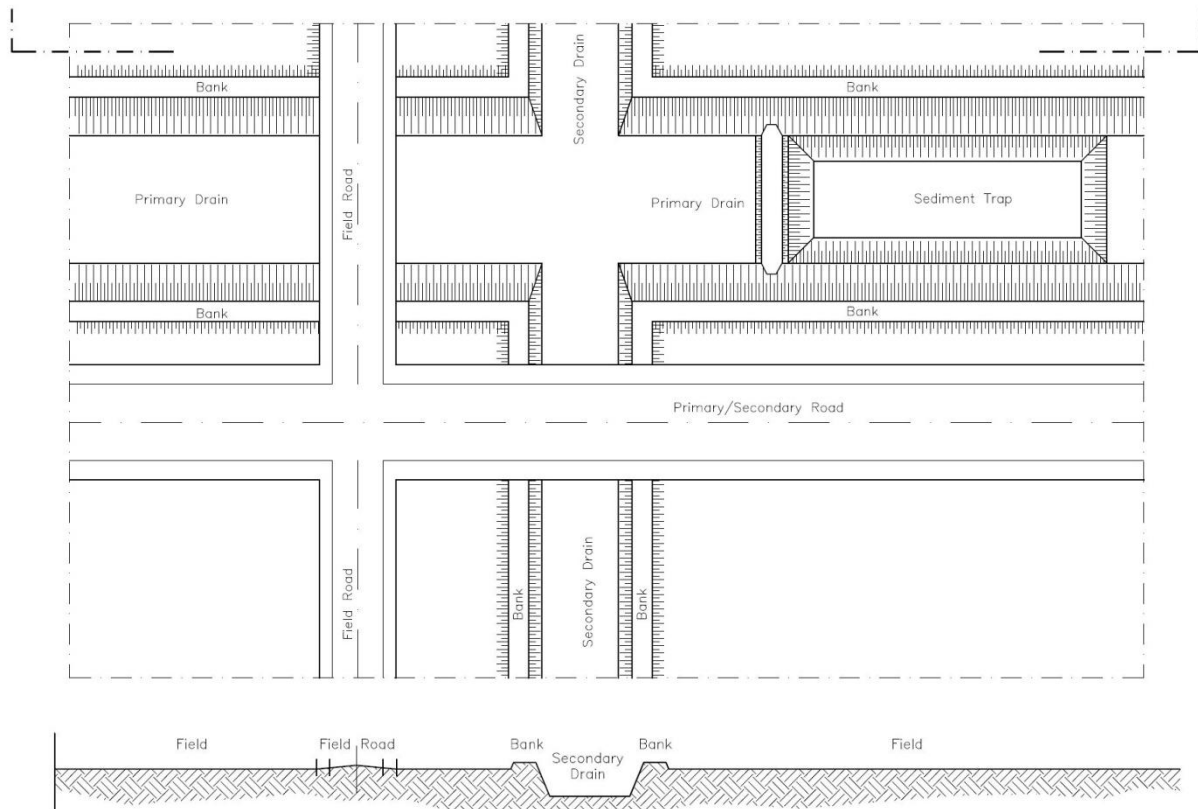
Planimetric view and cross section of fields, drain and road to identify designed banks
